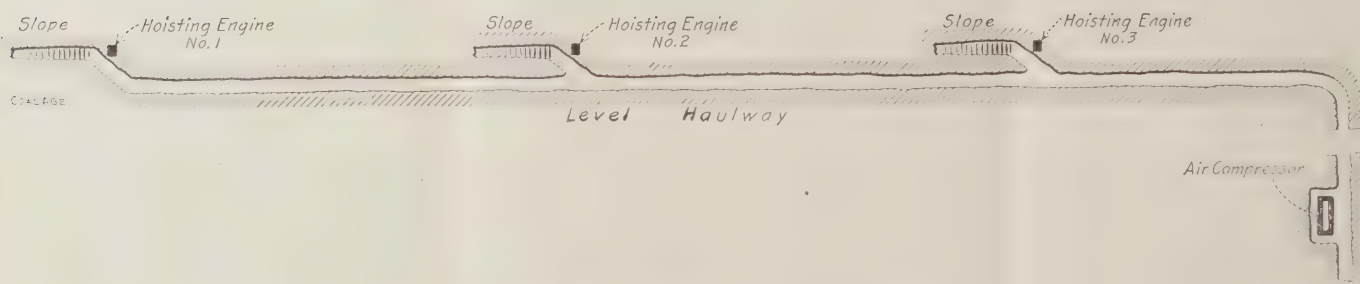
PLAN SHOWING SLOPES AND HAULWAY
